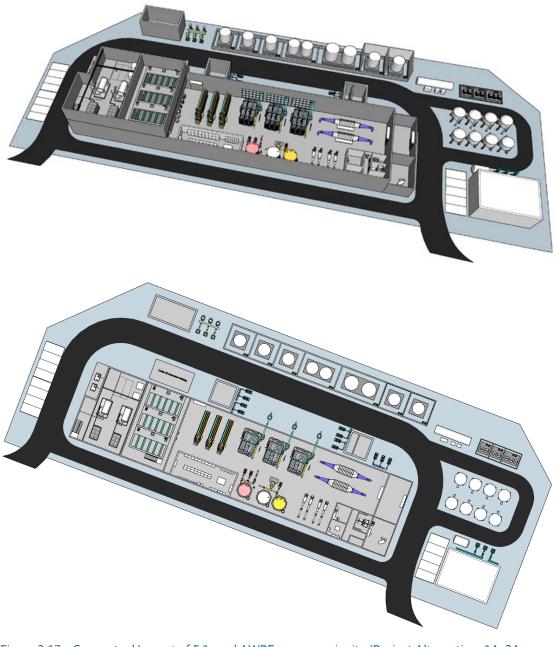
Conceptual Layout of 5.1 mgd AWPF on a generic site (Project Alternatives 1A, 3A, and 4A)
